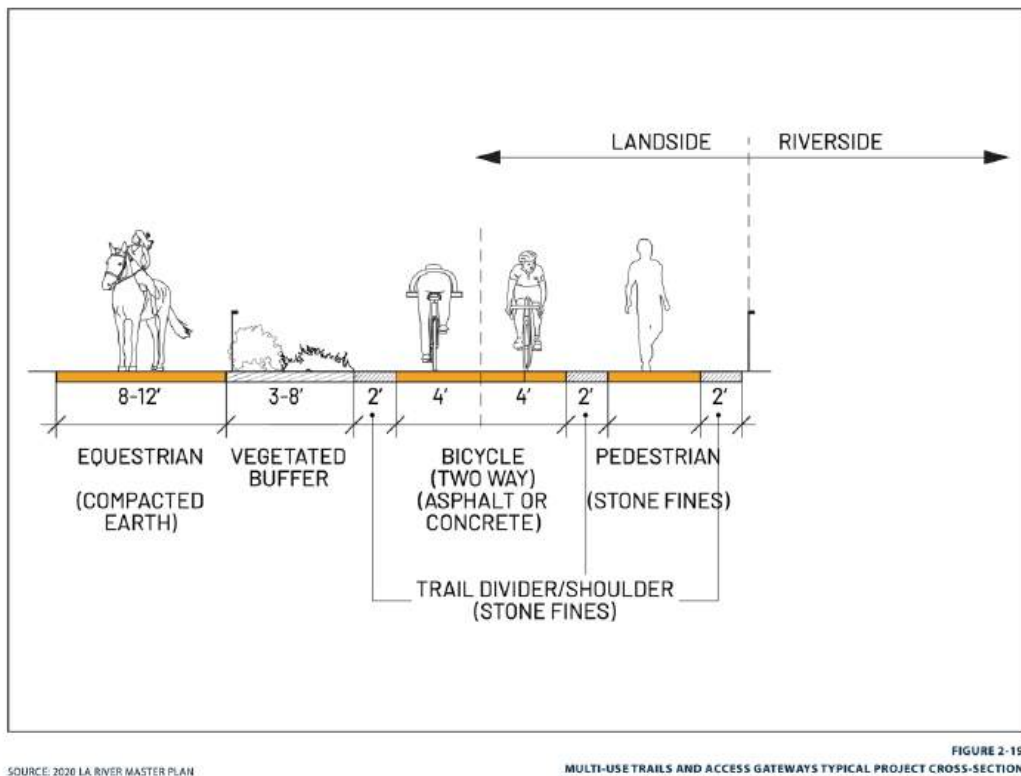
PROJECT PLANS – TYPICAL CROSS-SECTION
